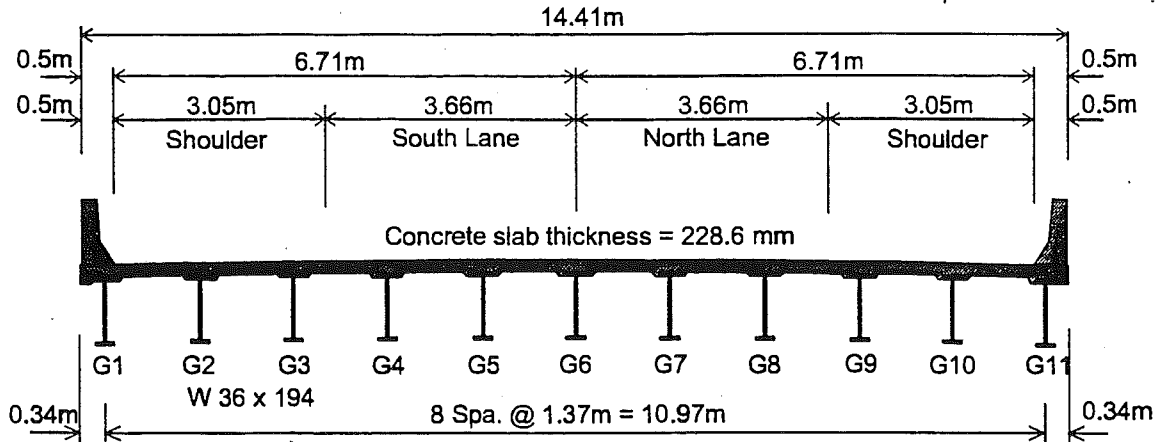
Cross-Section of Bridge M46/PR (B01-29041)
